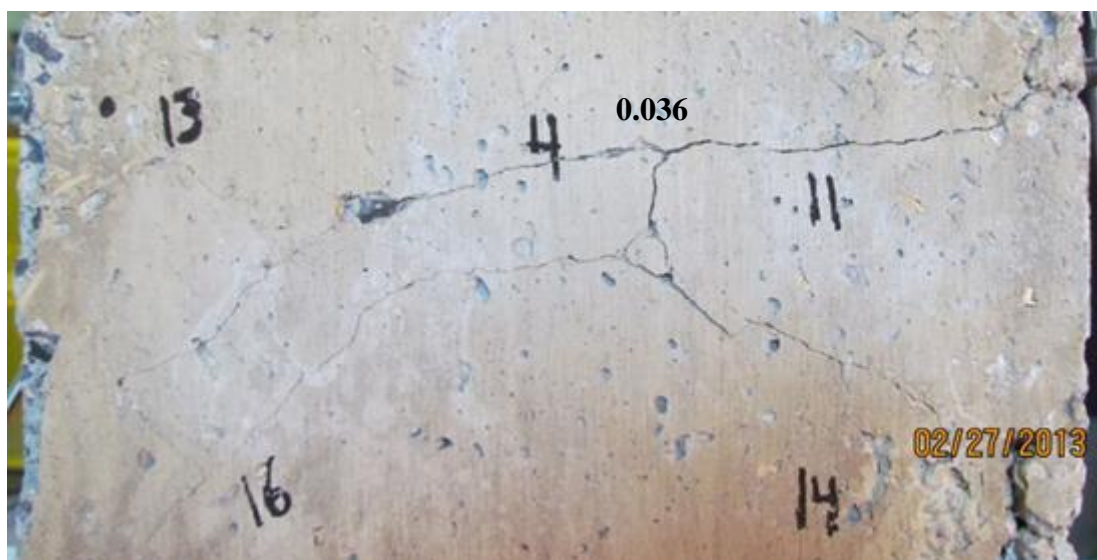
Cracks on east face of TS02 at Load Steps 26-28
